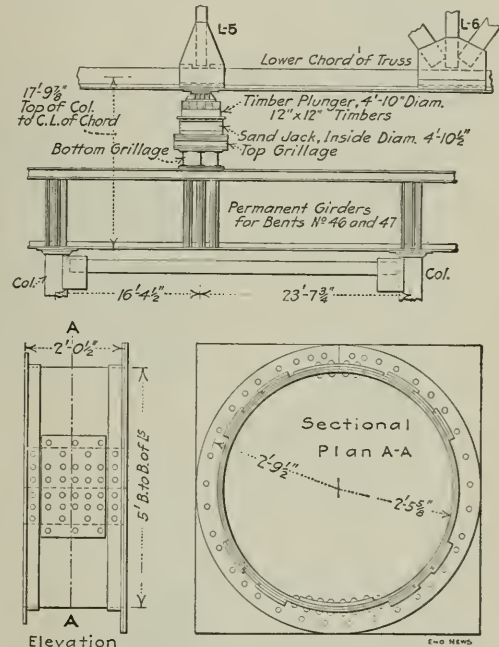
SAND JACKS FOR LOWERING THE FIRST TRUSS SPAN TO REST ON ITS OUTER TOWER
